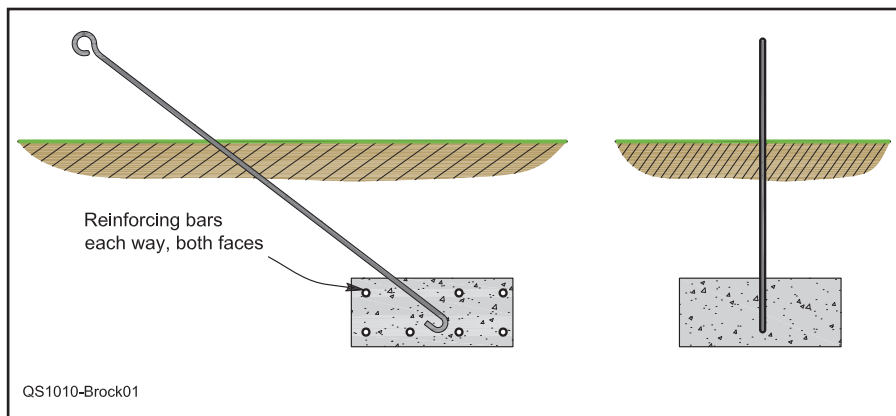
Detailed views of typical concrete encased buried guy anchor and rod. See www.rohnnet.com for detailed information about anchoring their towers.
